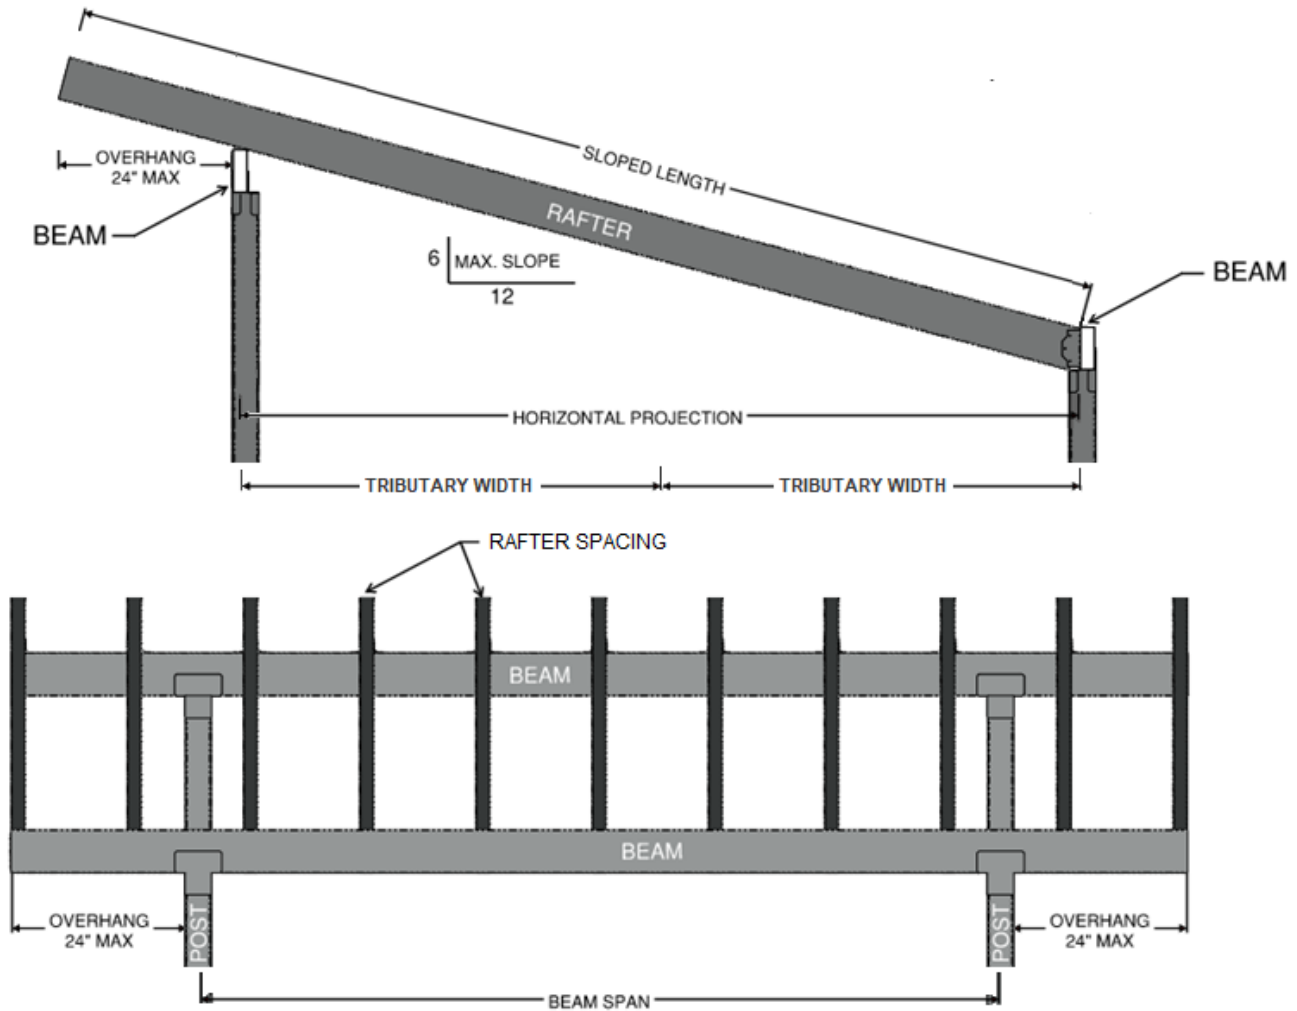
Rafter and Beam Span Definitions for Freestanding Sloped Rafters Roof Framing
